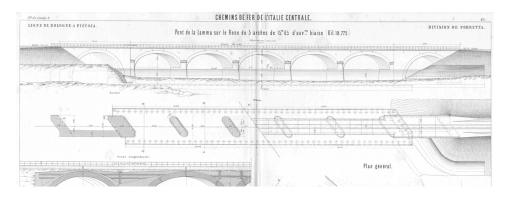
Jean Louis Protche, plan of the bridge in Lama di Reno (Protche, 1864)
